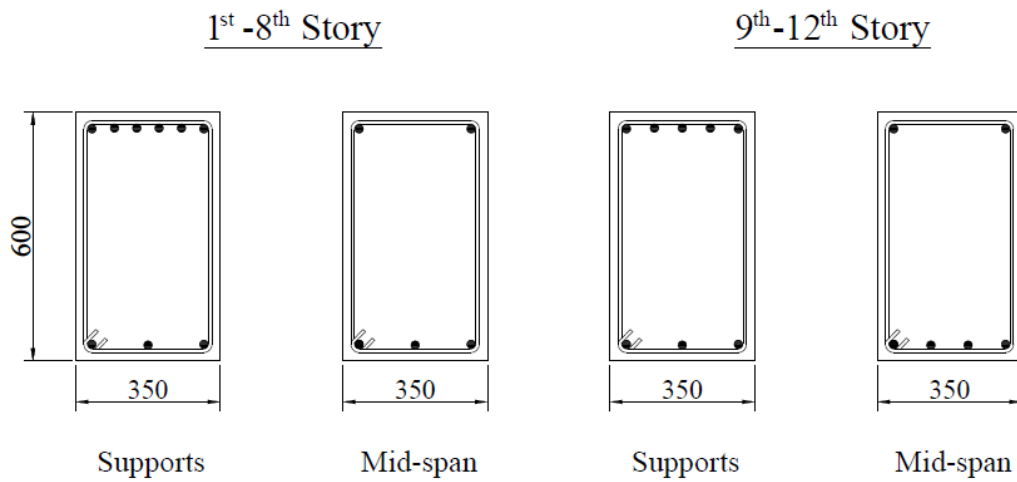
Cross Sections for Beams of 12 Story Irregular Frame
